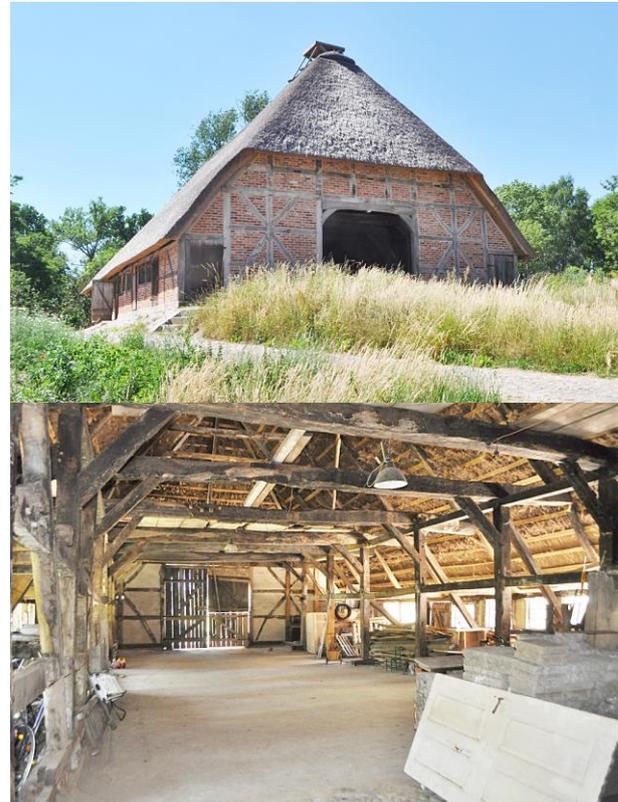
half-timbered hall house, the redevelopment required the strength grading of the timber members – top: exterior view; bottom: interior view of the load-bearing structure
